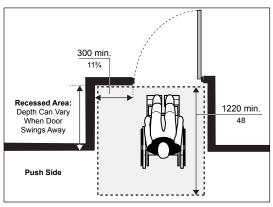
Push Side Approach at Recessed Swing Door - Plan View
